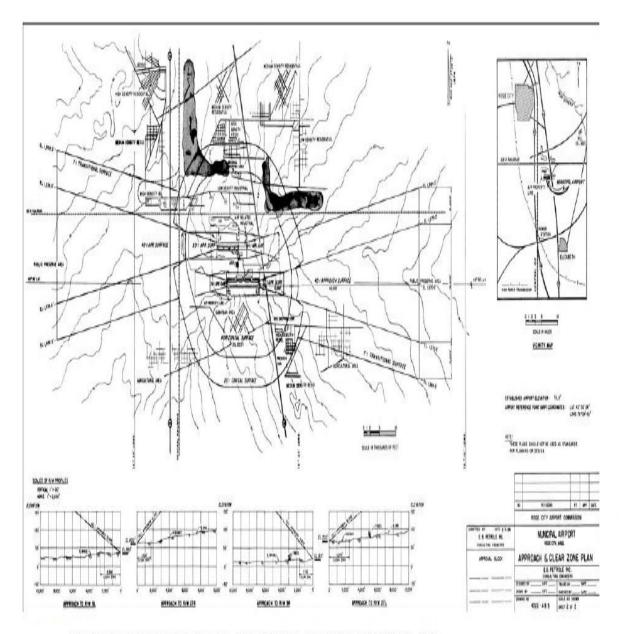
Sample runway and approach plan. (From FAA, Airport Master Plans, Advisory Circular AC150/5070-6A, 1985.)
